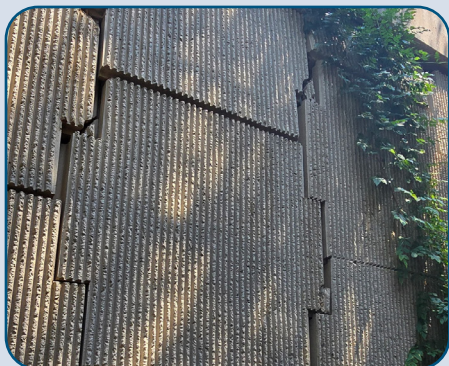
DNT MSE Wall Racked Panels at IH 635.
